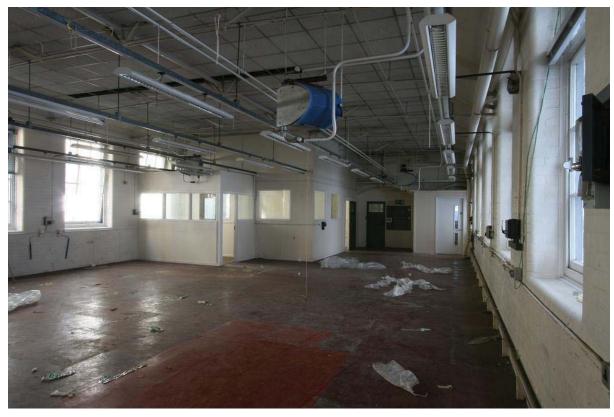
Bindery first floor workroom BMB/2/4 looking east.
